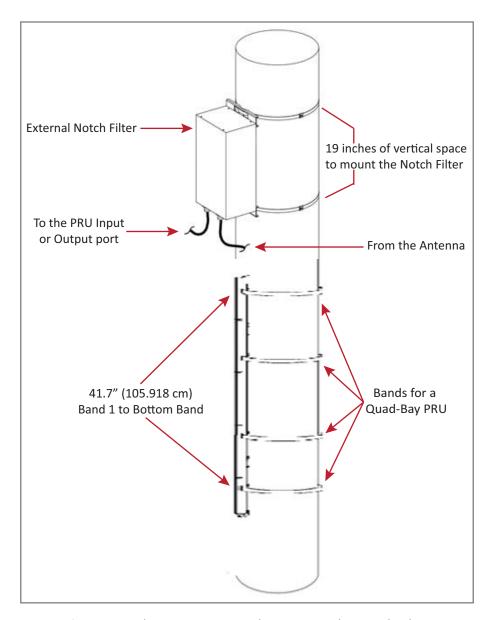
Pole Mounting a Quad-Bay PRU with a Notch Filter
